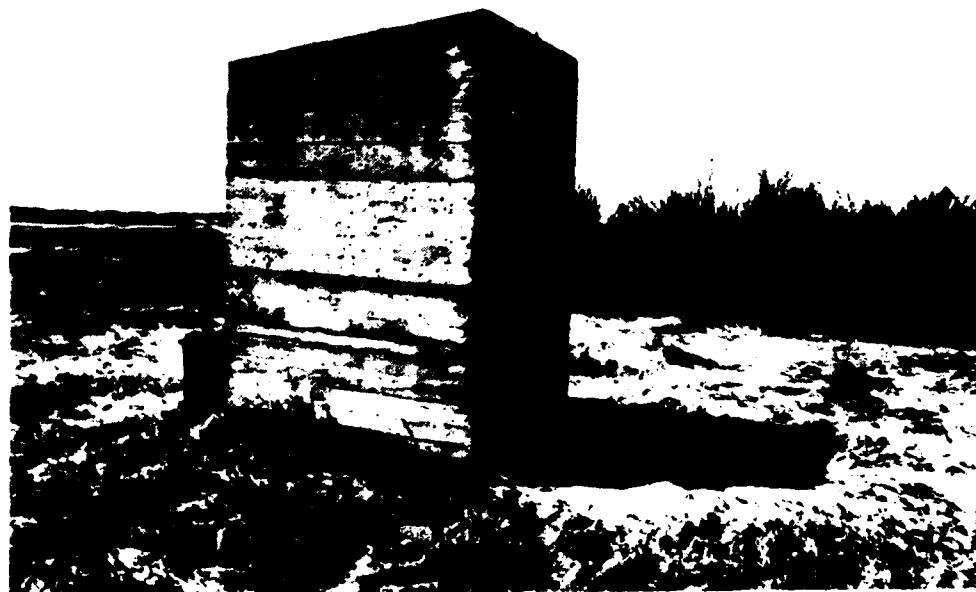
Feature 4: standing concrete structure (partial building remains), view to the southwest showing north and east walls.
